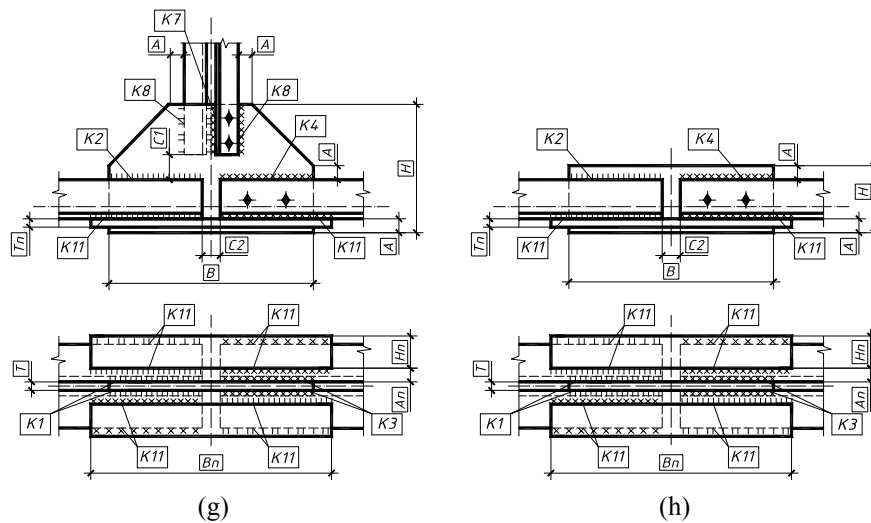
continued. Erection joints in trusses with elements made of double angles.
